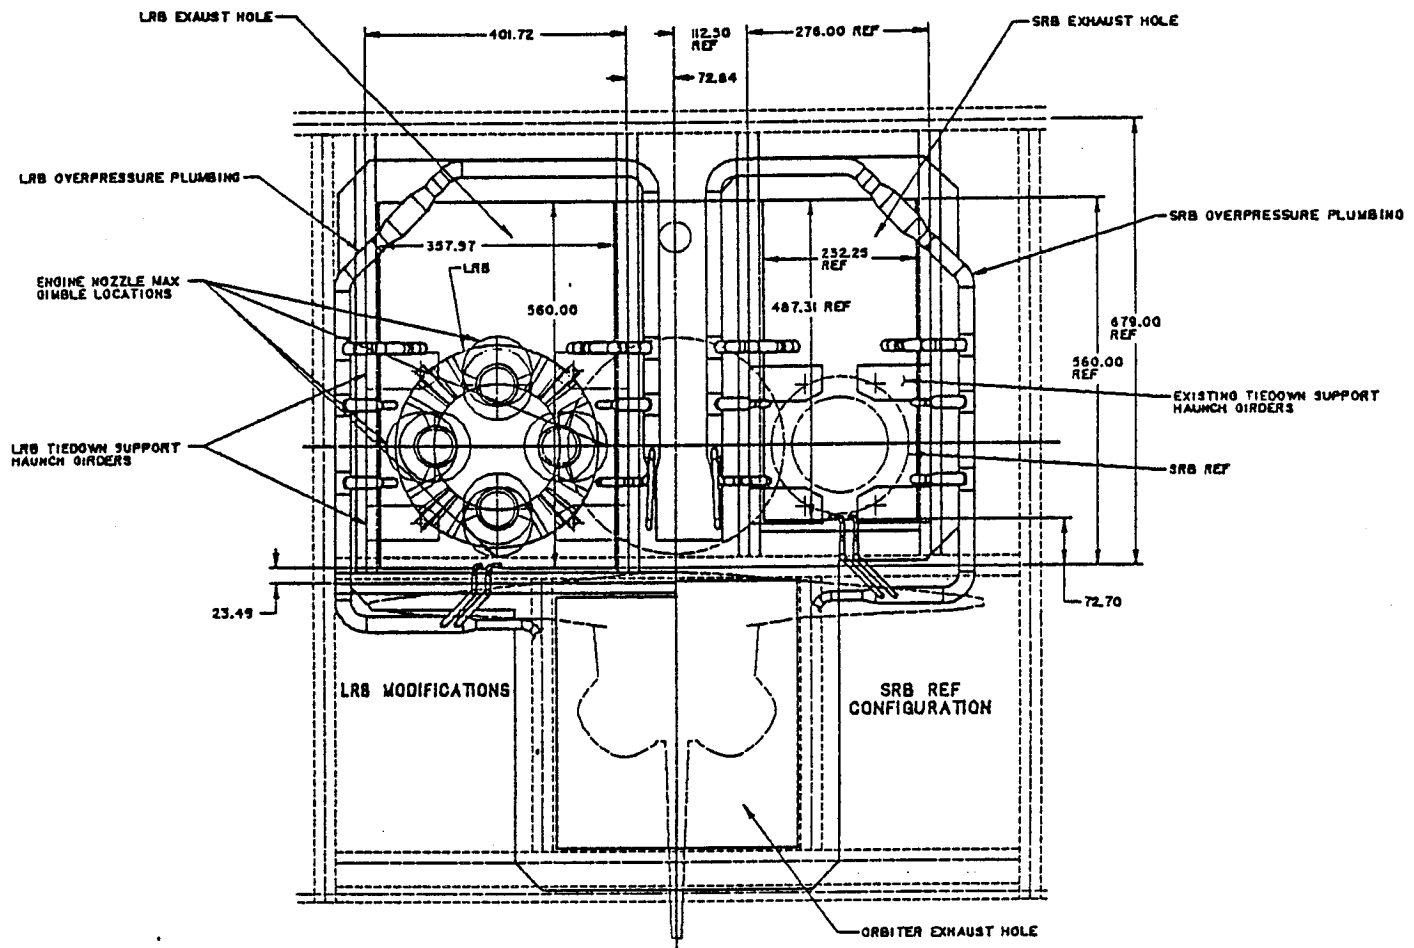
SRB Over Pressure Plumbing
